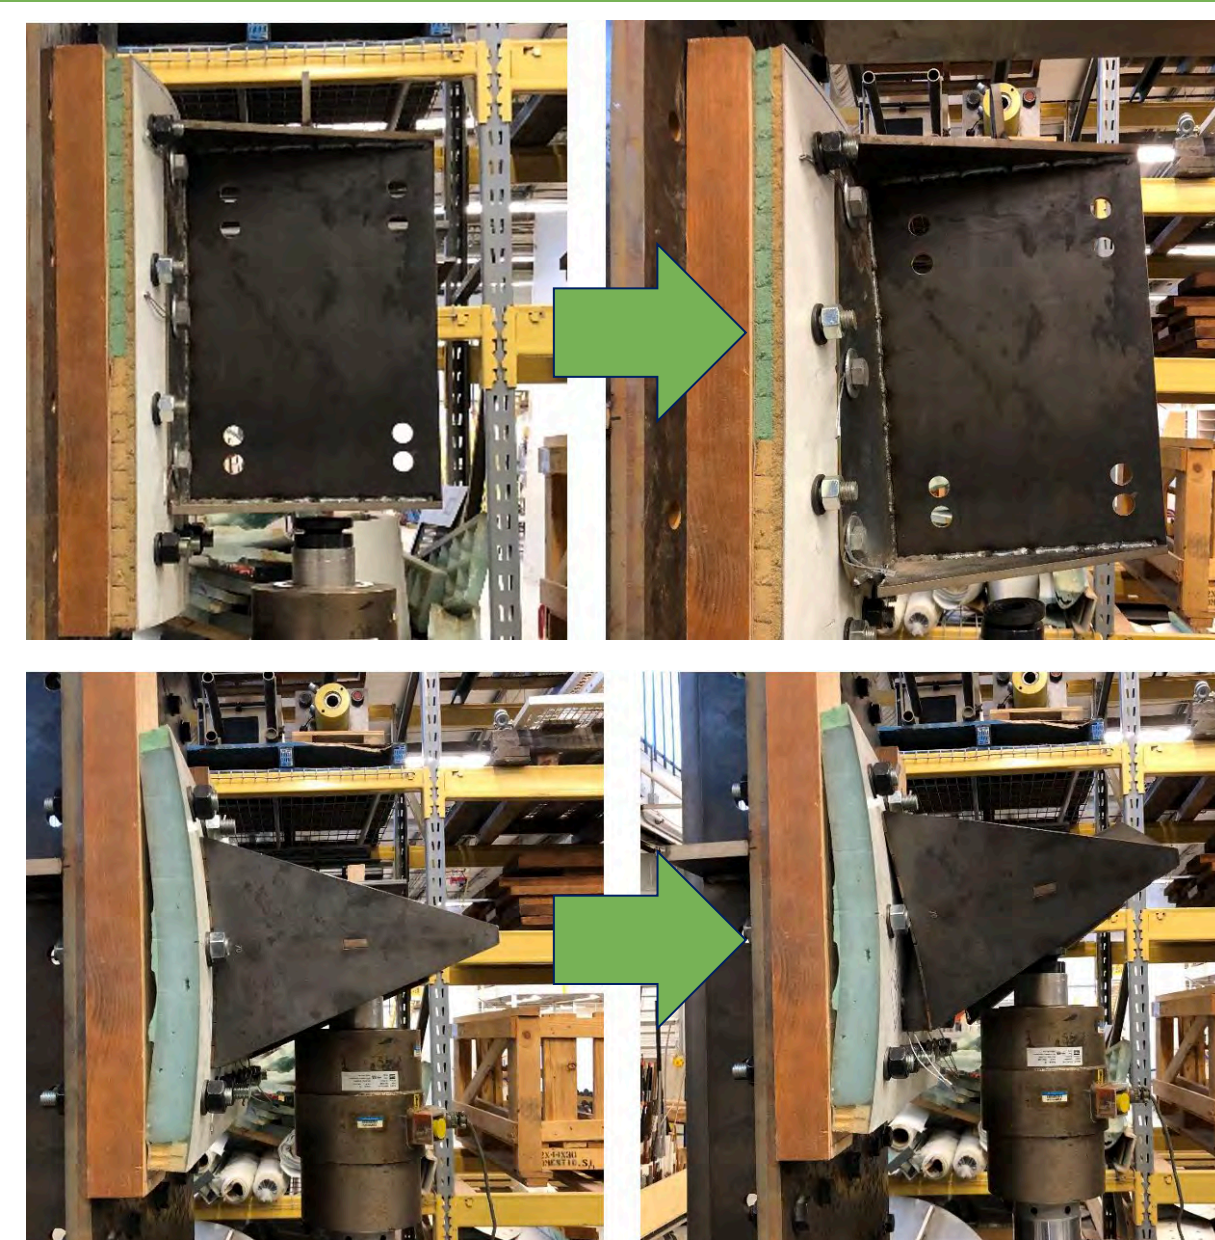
Major (top) and minor (bottom) axis connection testing. Wind blade is stronger than the steel in the universal connector
